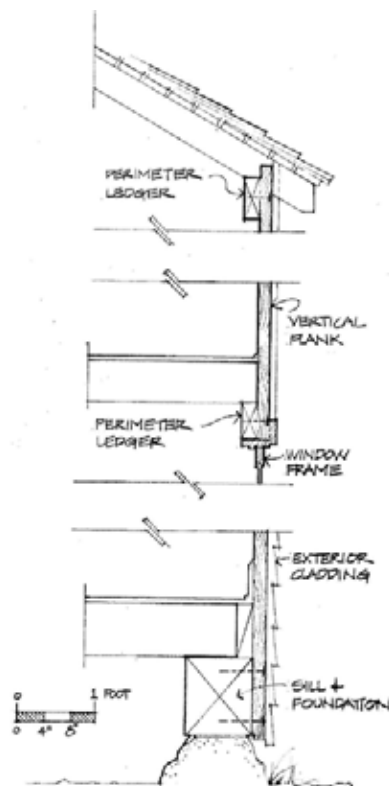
Schematic vertical plank construction - wall section [C.K. Krafft 2014]
